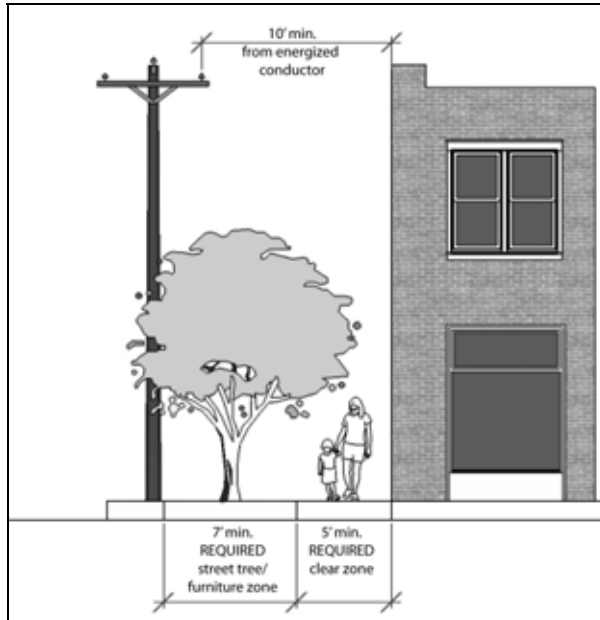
Above-Ground Utilities on TOD Local Street with utility compatible tree
